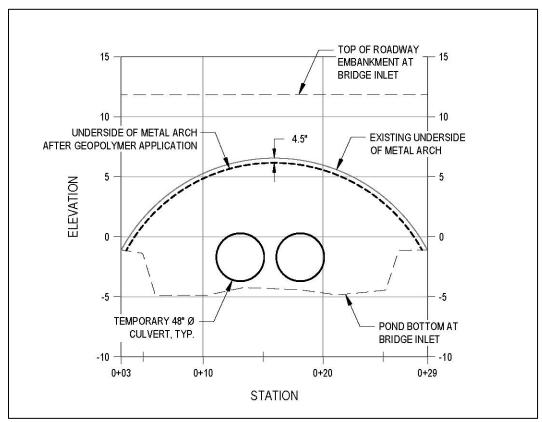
Water Diversion Alternative 2.3 Bridge Inlet Cross-Section
